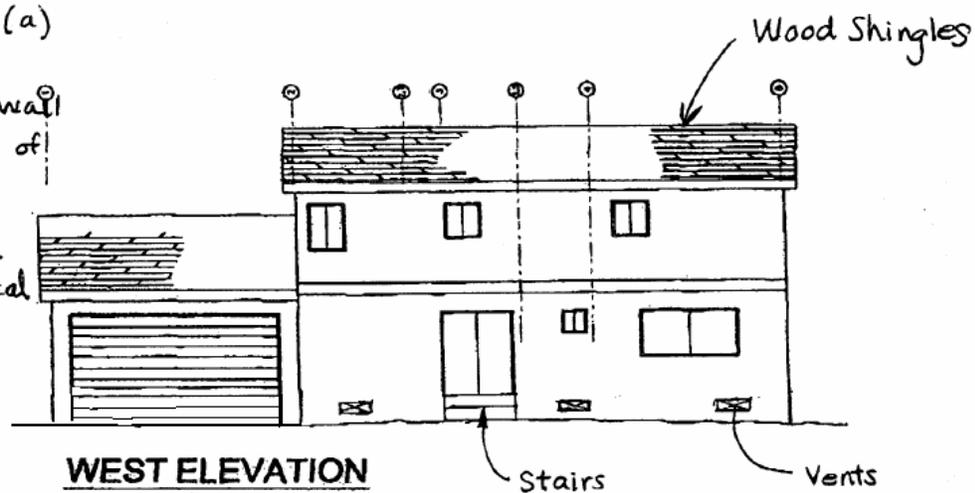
Index building 4 exterior elevations (sheet A2, right)
